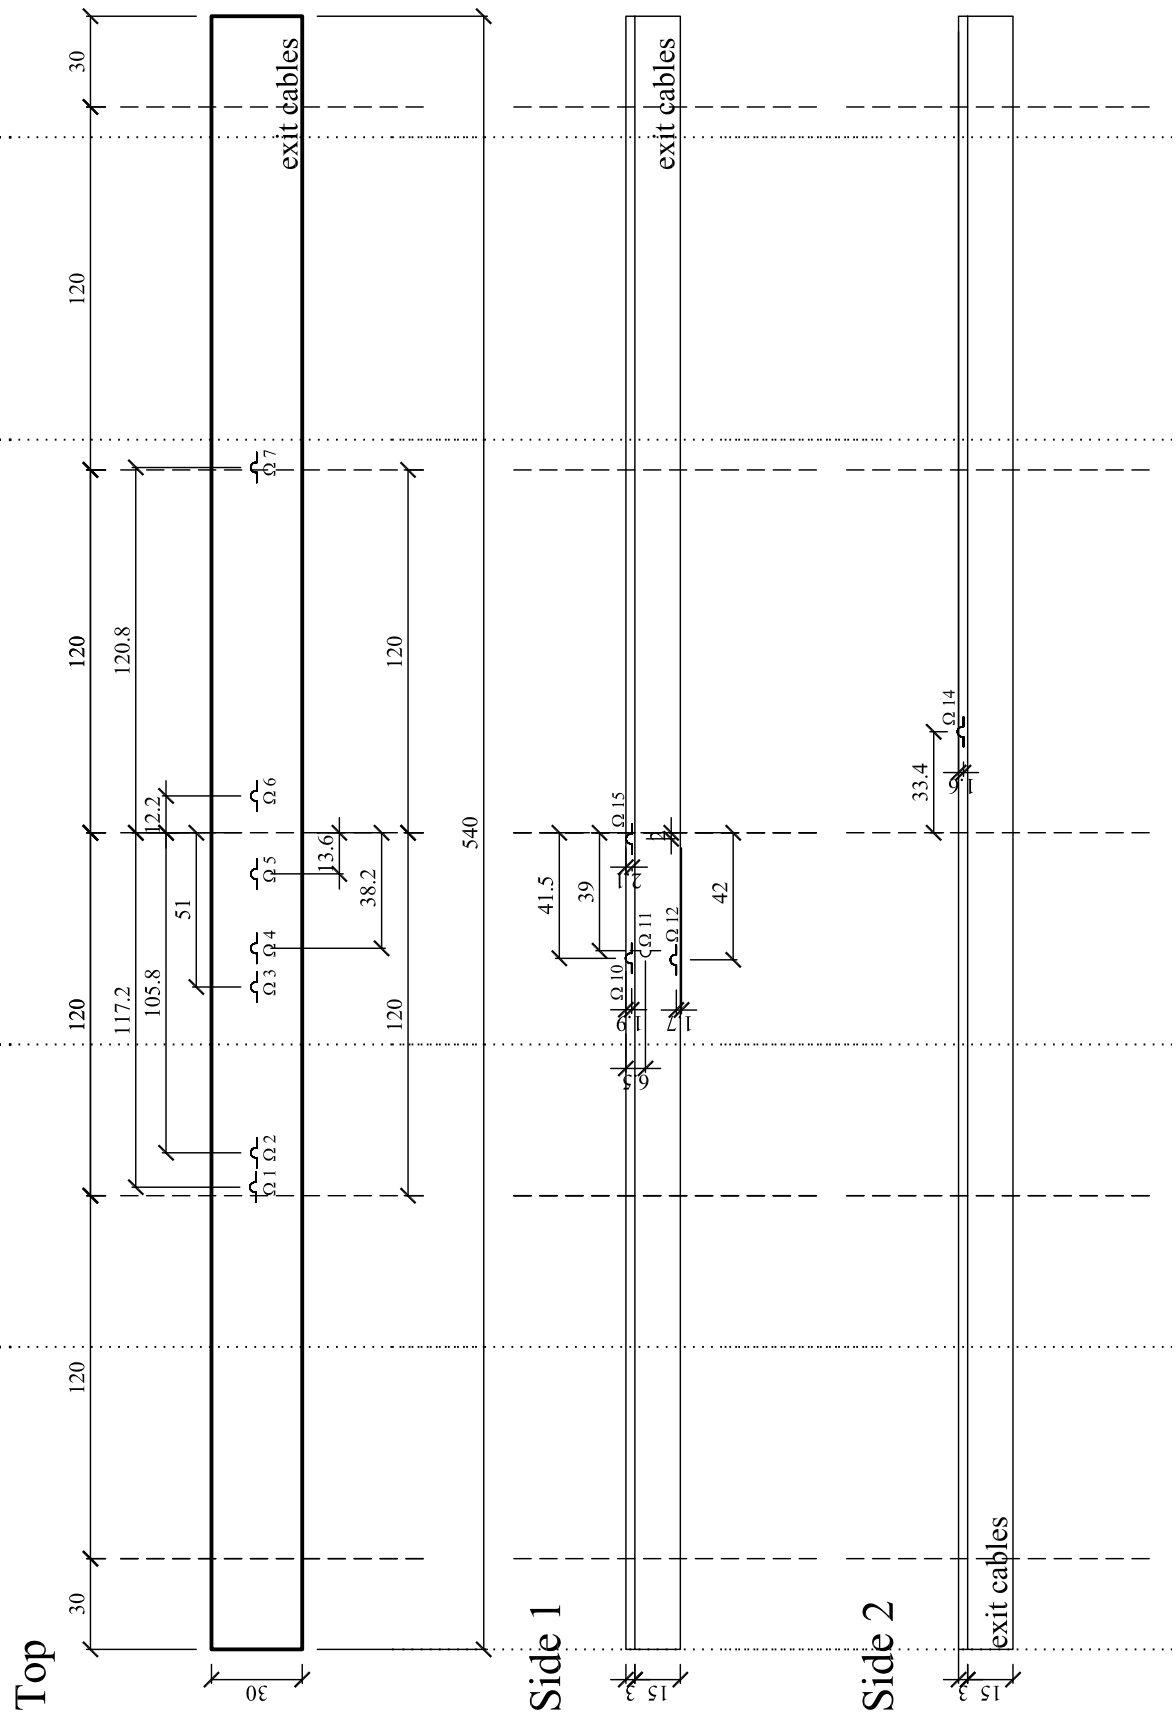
Position of the Ω -gages during the fracture test: H3
